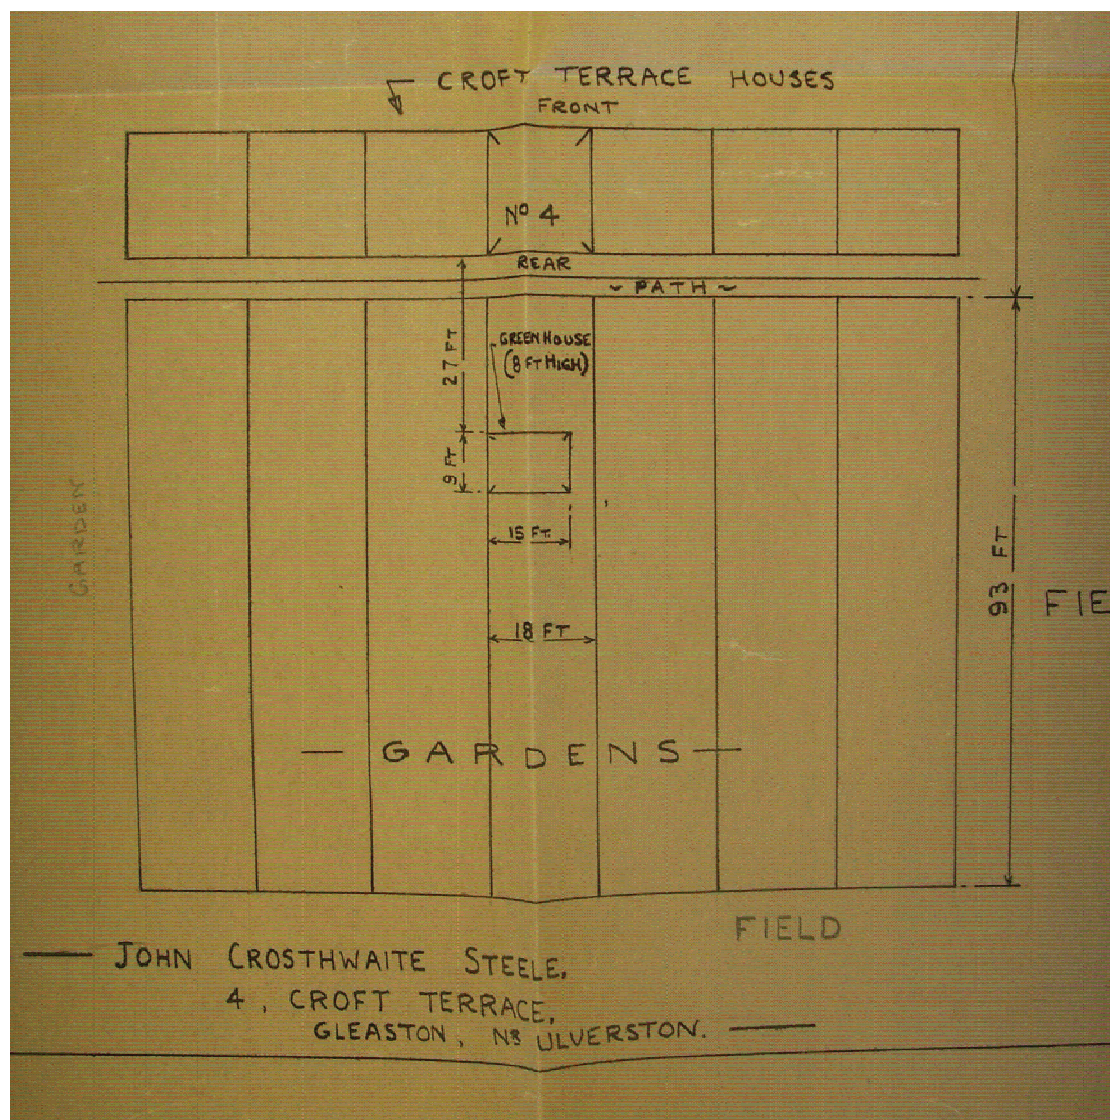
Plan of a proposed greenhouse to be built for No. 4 Croft Terrace (CRO(B) BSRD/NL Ulverston RDC Building Plans 3/2278 1948)
